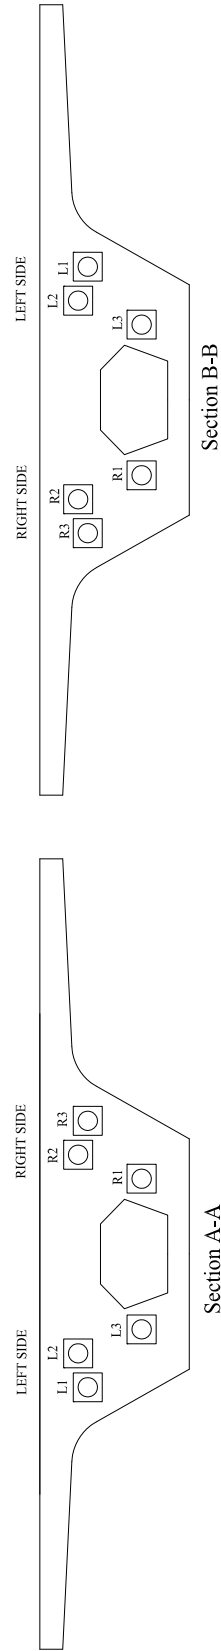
Typical Numbering System for Tendons of a PT Girder.
